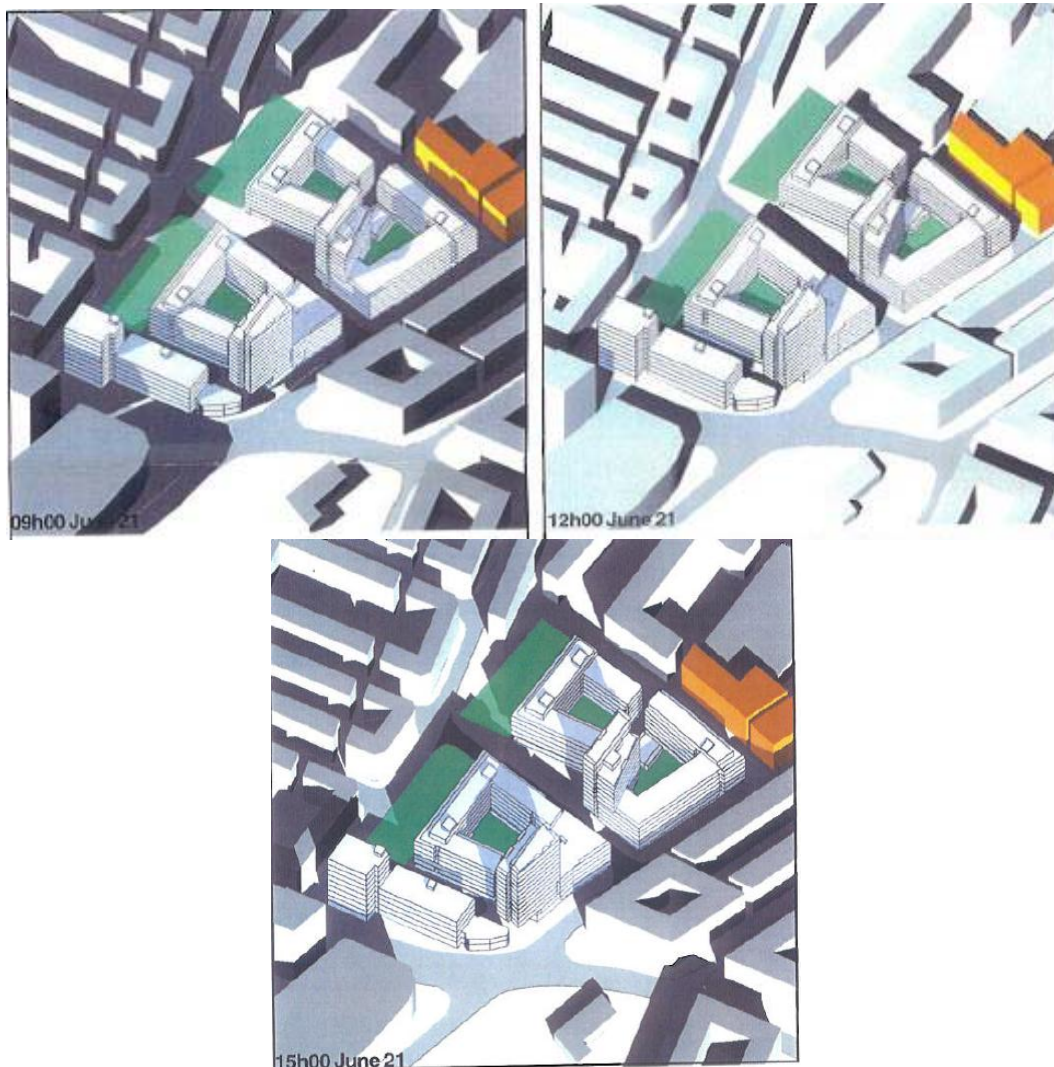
Masterplan overshadowing analysis illustrating impacts to the northern elevation to Block B.
